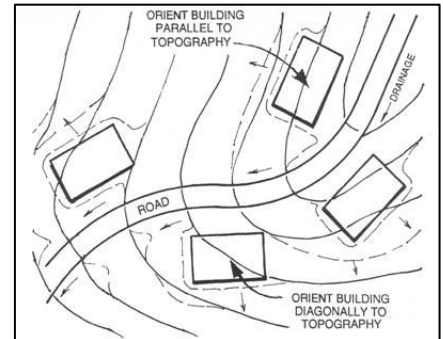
Orient buildings and roads to topography to minimize earthwork.
